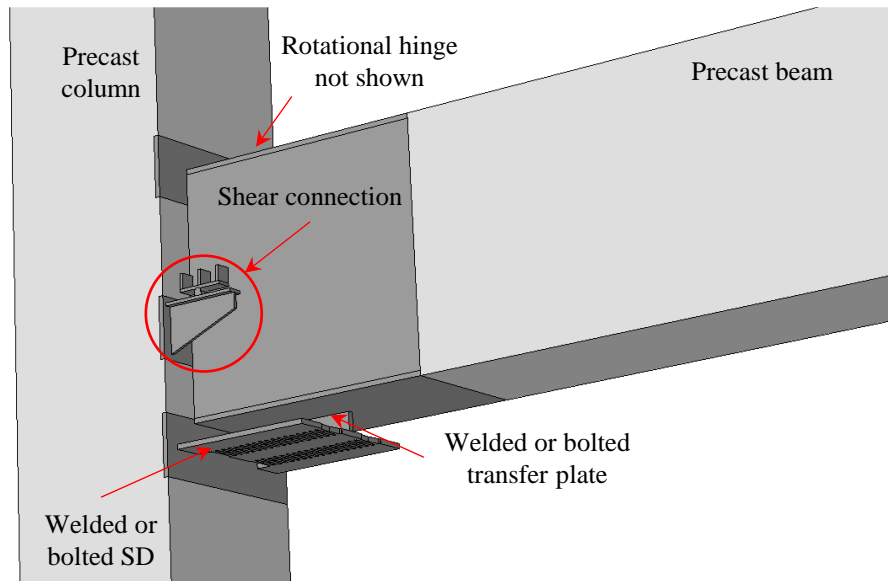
Isometric view of the beam-column connection equipped with the SD.
